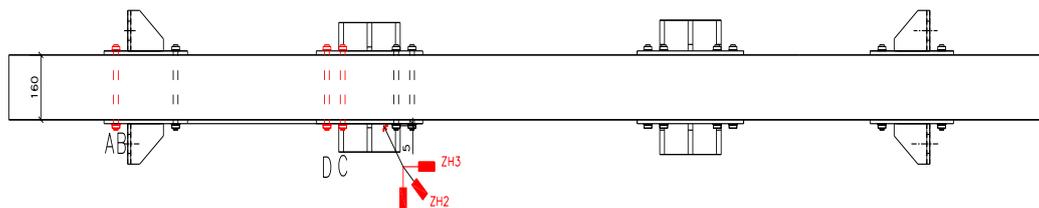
c Anchor Plan View & Deviator Strain Gauge Arrangement Points
